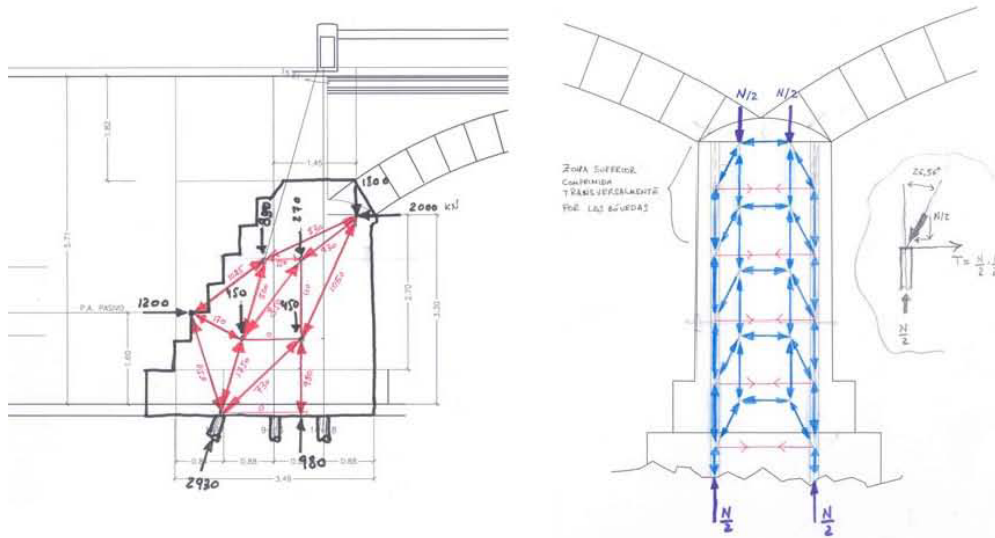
Strut-and-tie models in abutments (left) and piers (right) to design horizontal nailing.
